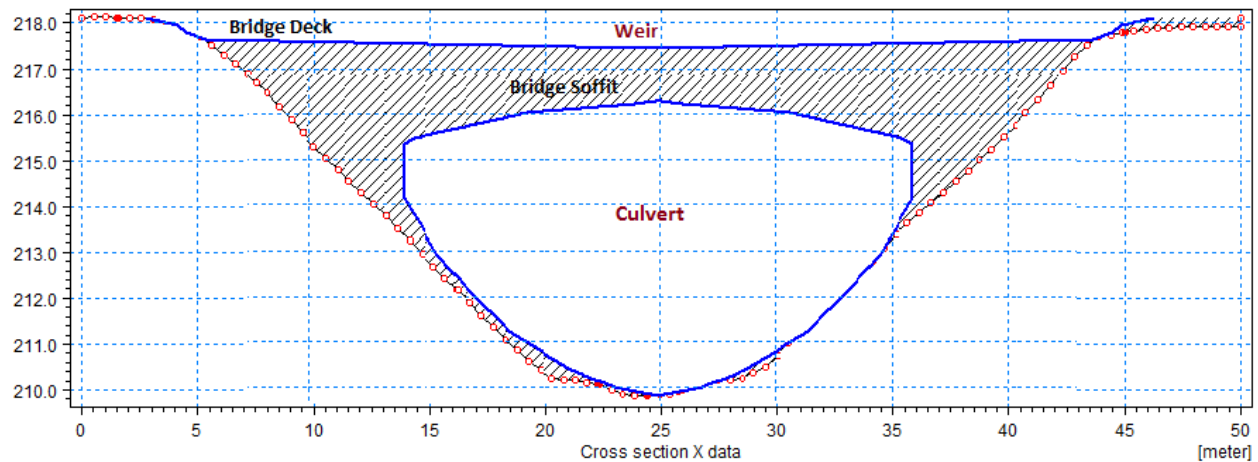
Bridge Modelling Schematic with Combined Culvert and Weir
